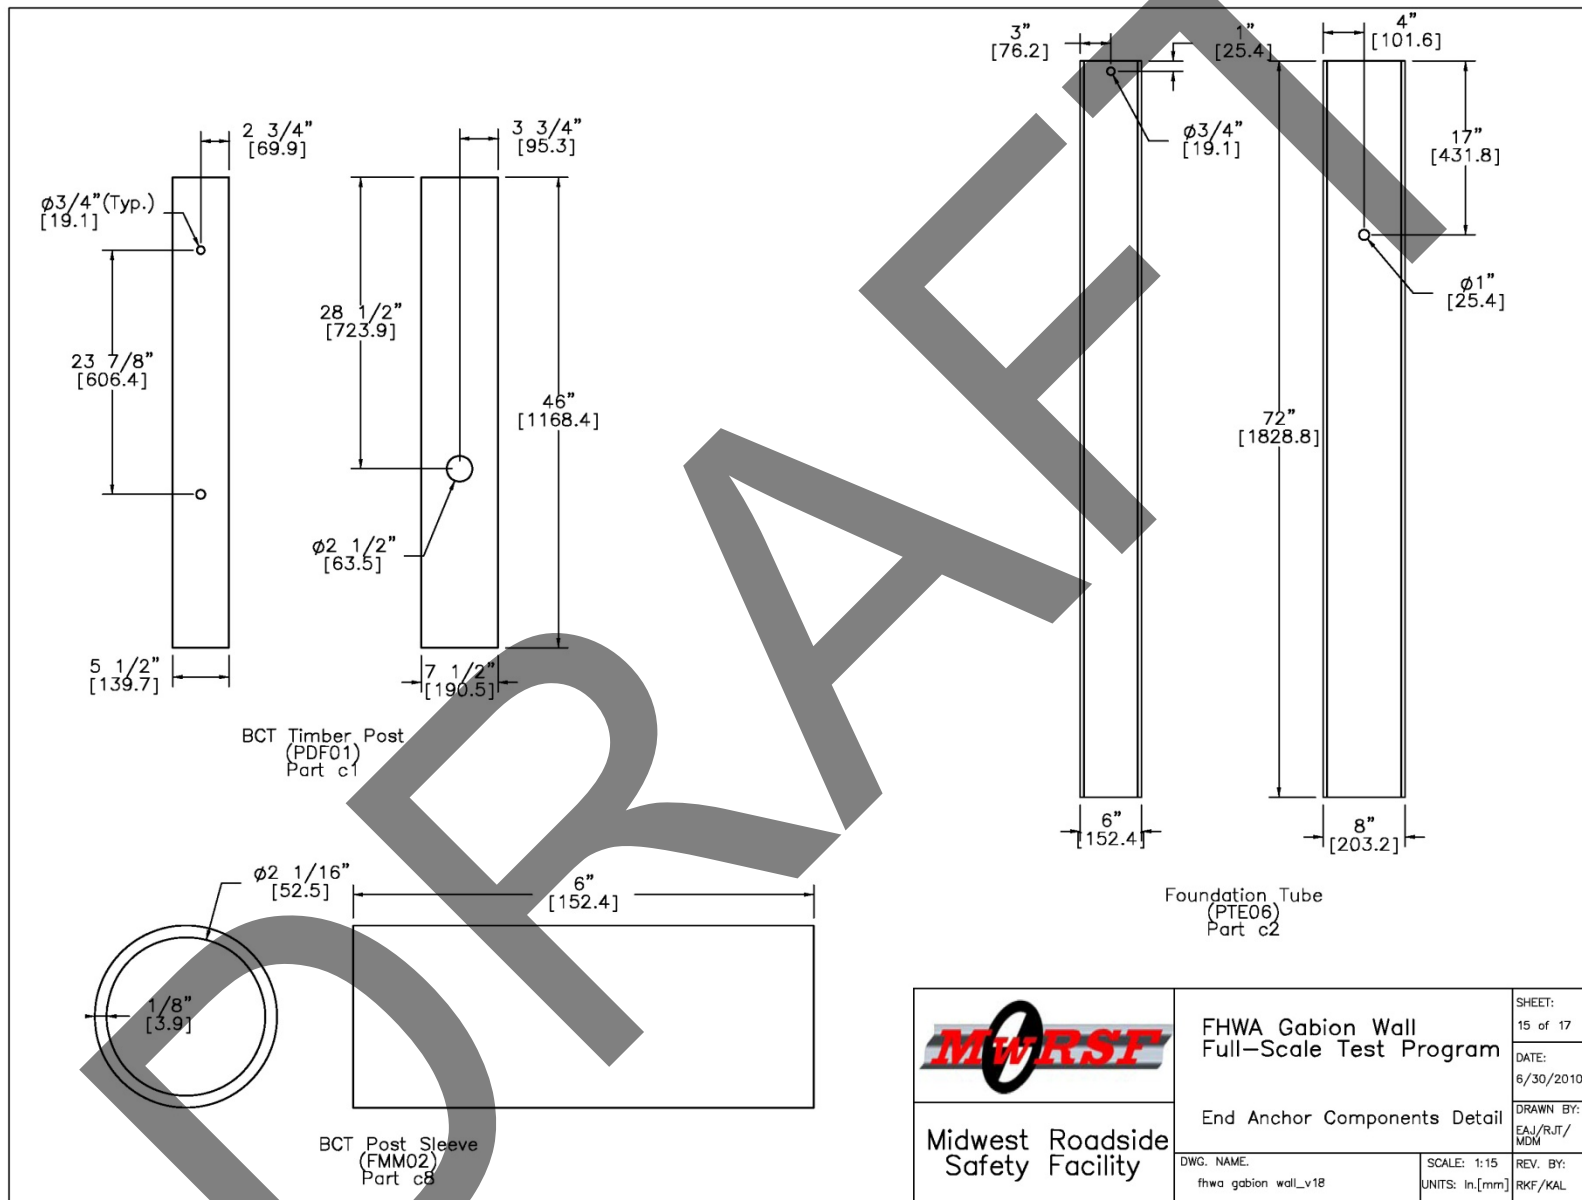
Schematic. Foundation Details, Test Nos. MGSGW-1 and MGSGW-2.
